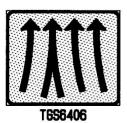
Overhead Signs (Ref: Vol1-4.10.41 Vol4-8.8.3/8.8.4)
